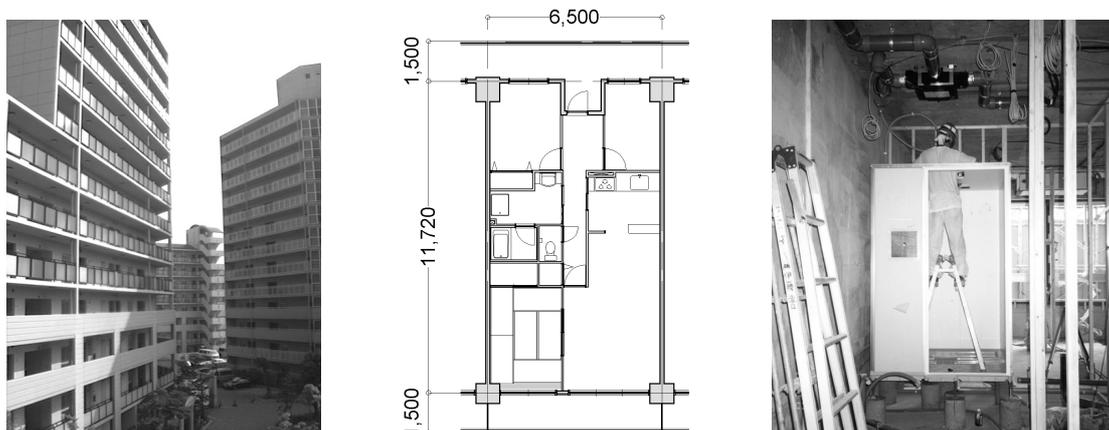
Residential Buildings, a Dwelling Unit Plan, and a Bath Unit Constructed in the Post-1980 Period
